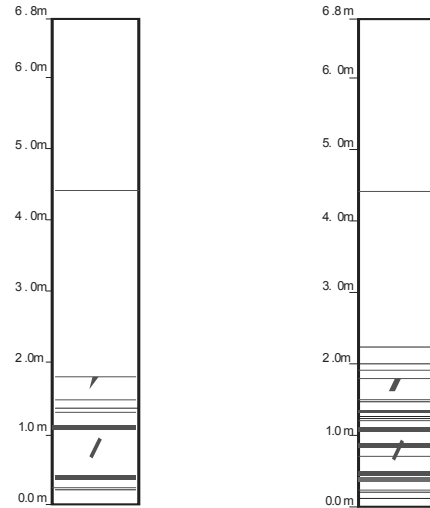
Endoscopic observations - support with frame spacing of 1.2 m.
